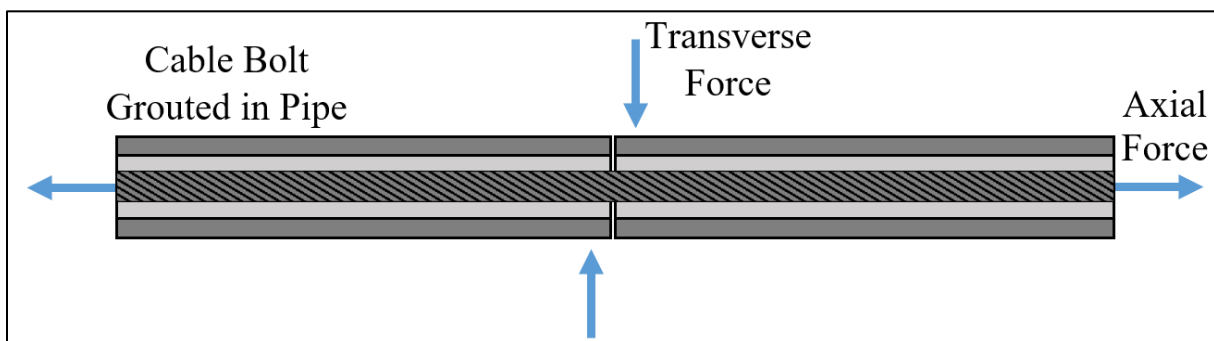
Cross-section shear test on cable bolt grouted in pipes and subjected to shear and tensile forces
